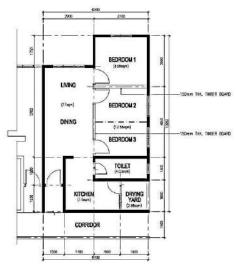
A typical floor plan and floor area of PPR House occupied by asnafs (18-storey flat)
